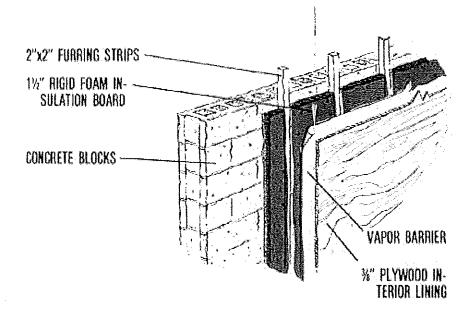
Concrete block wall (R=10 if standard blocks, 14 if lightweight blocks with cores filled). Concrete block walls may be insulated inside by using furring strips and, in new construction, by filling the block cores with insulation.
